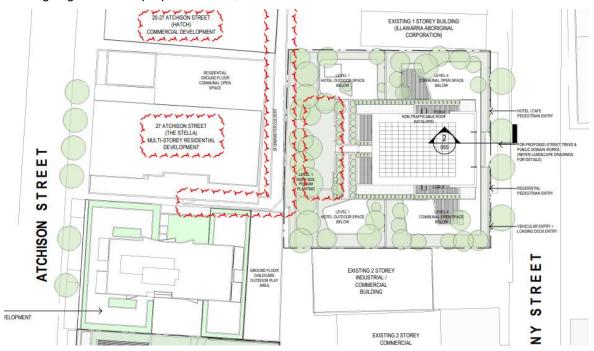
Site plan showing the position of the porposed tower in relation to 27 Atchison Street
